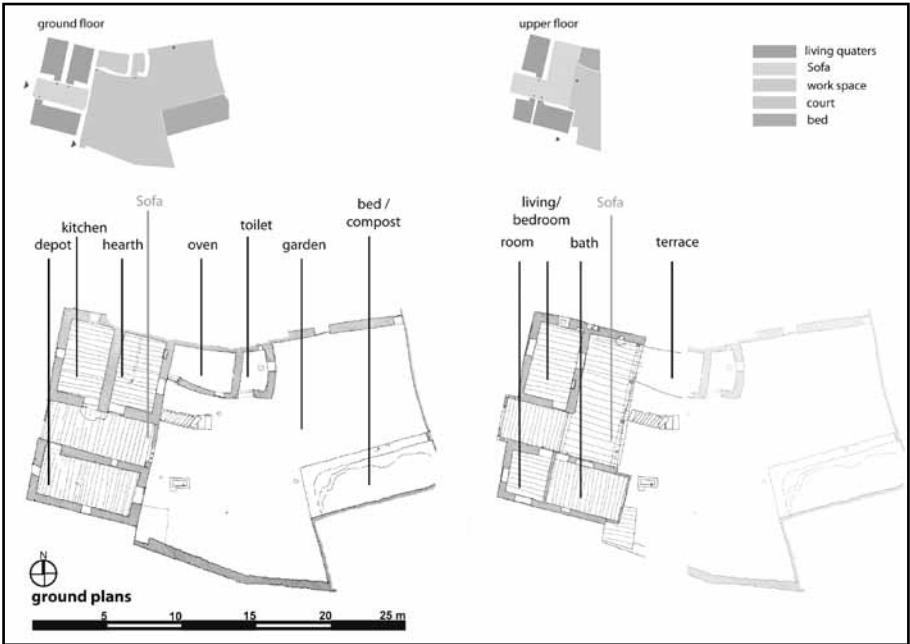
Turkish house, plans on ground level and on that of the upper floor
